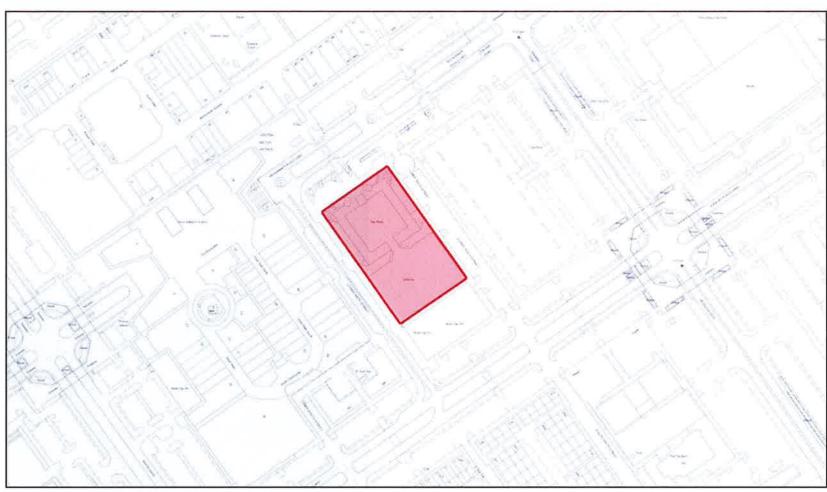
SIte Boundary Plan (Source: O.S.).
